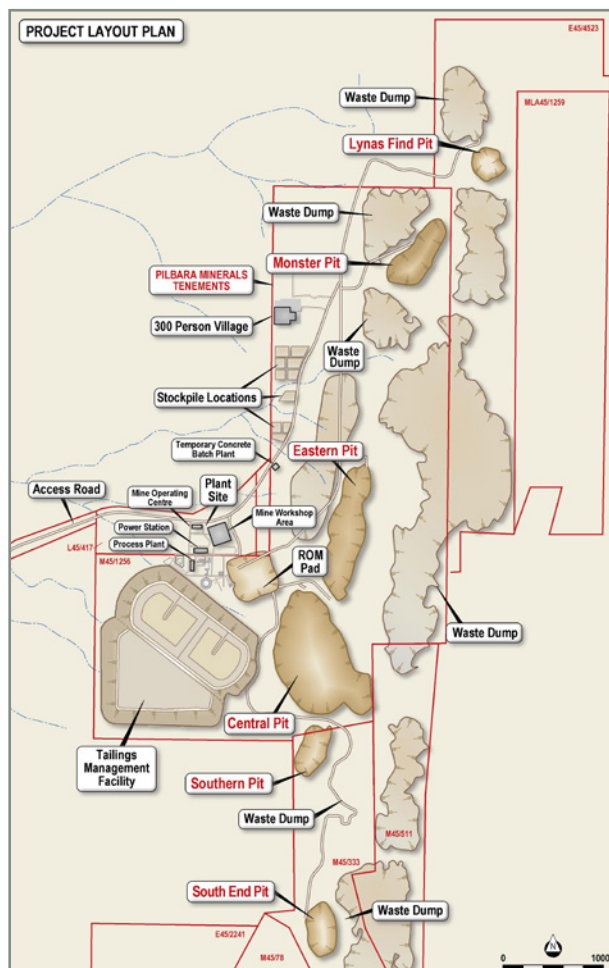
PILGANGOORA PROJECT - SITE LAYOUT
